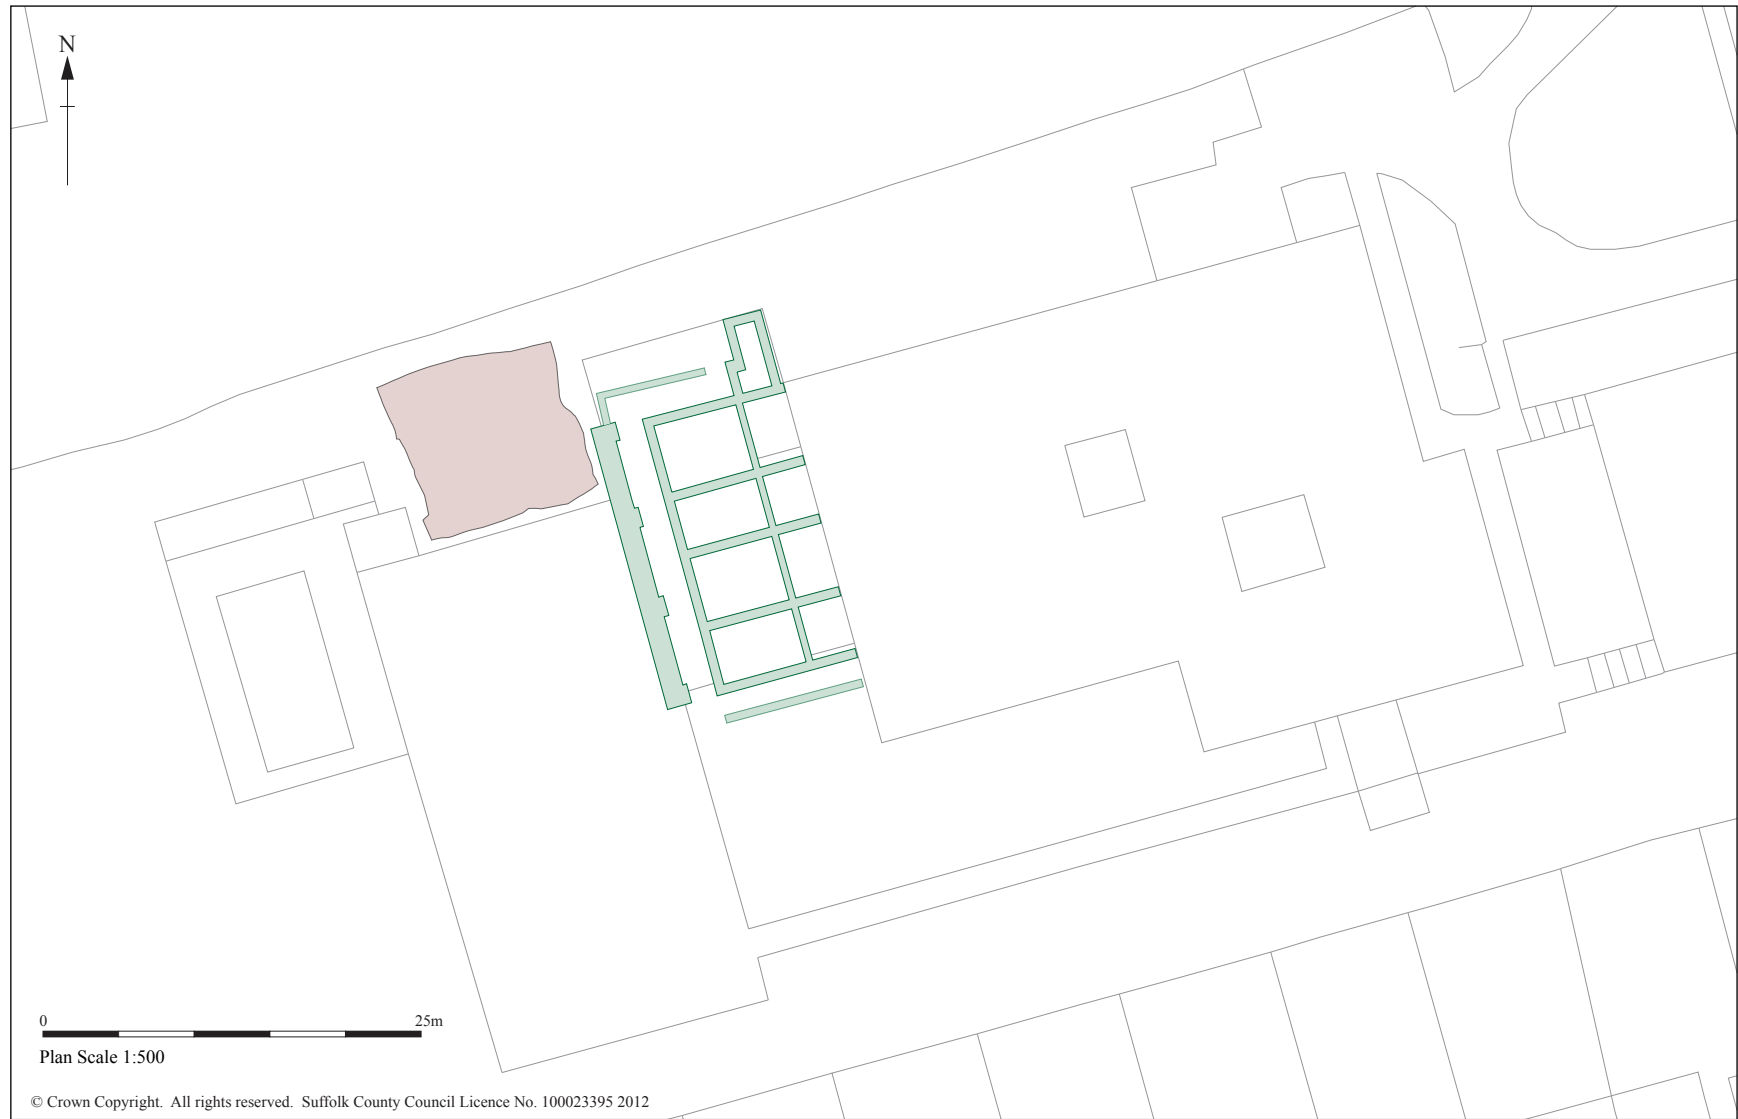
Plan locating the monitoring trenches (green) and areas of excavation (brown)
